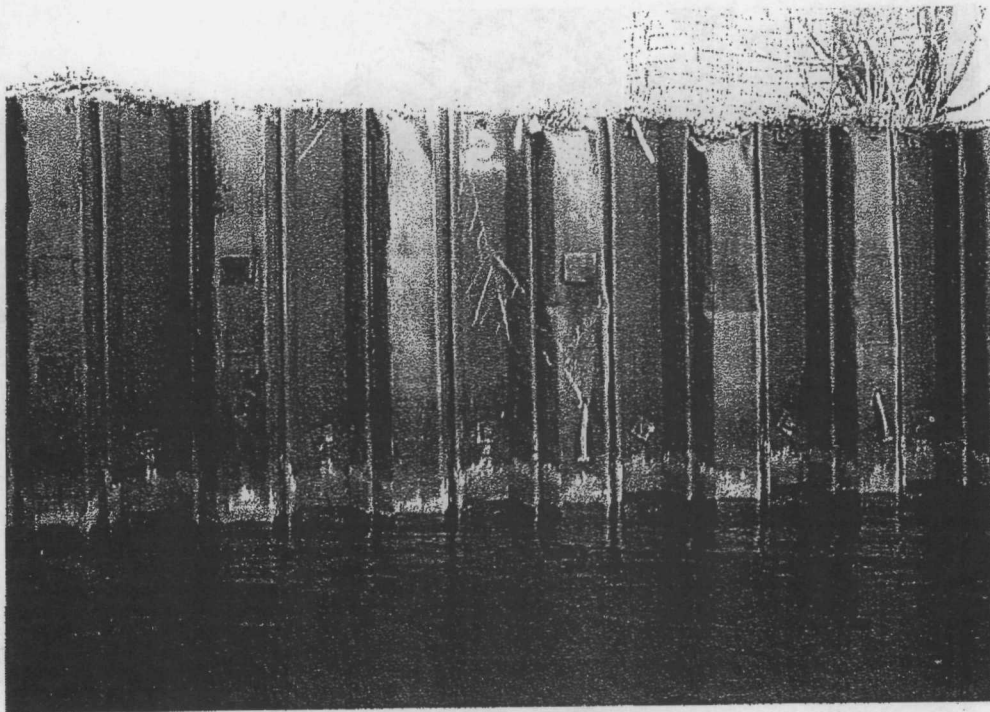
Dockwall at Station 0+30, Looking Northeast.
